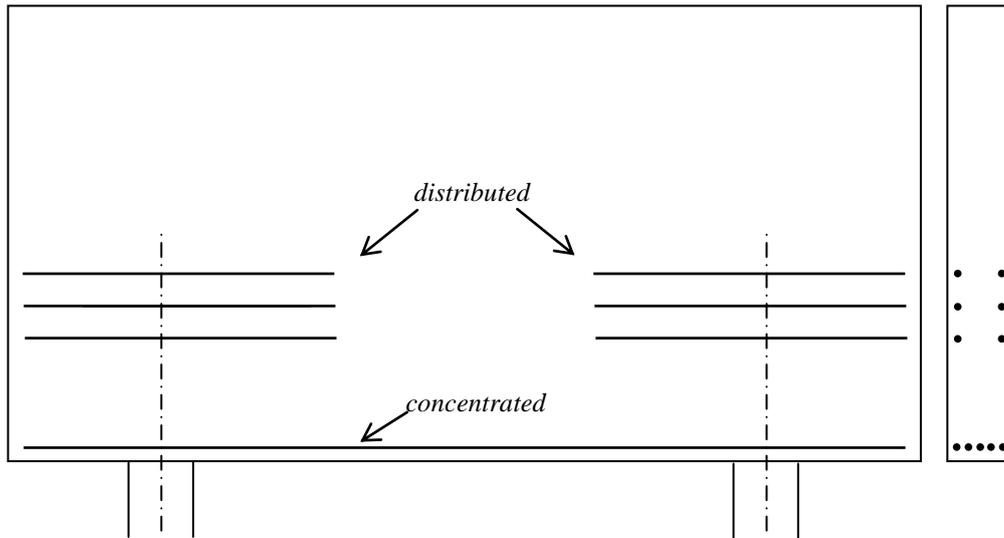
Reinforcement sketch of the beam in Figure 3.38.
